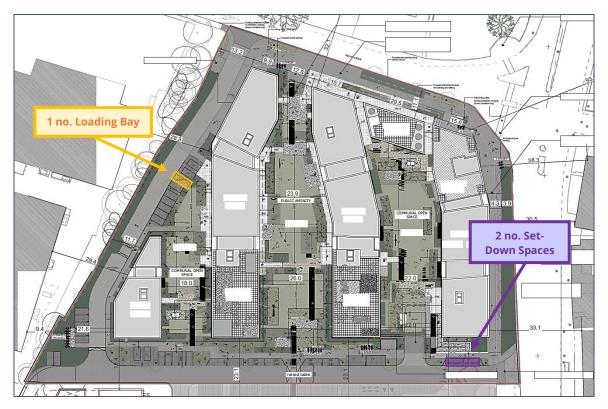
Location of Proposed Loading Bay and Set-Down Spaces
